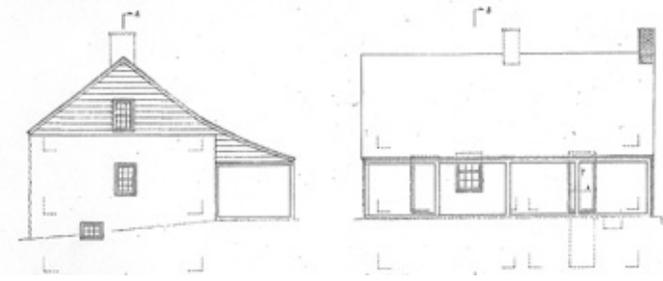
Existing conditions, south & east elevations. Original basement entrance sketched in on north end of east side. Drawings by John Stevens, 2019.
